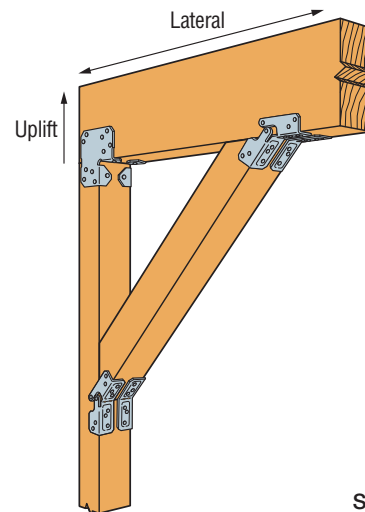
Typical LCE Post Cap Installation with Knee Bracing
